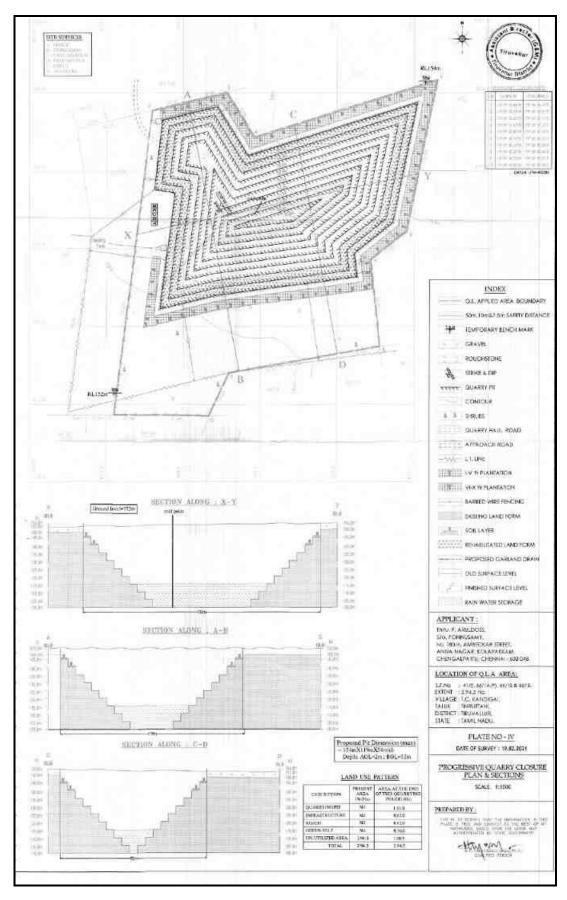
CLOSURE PLAN AND SECTIONS - PROPOSAL
